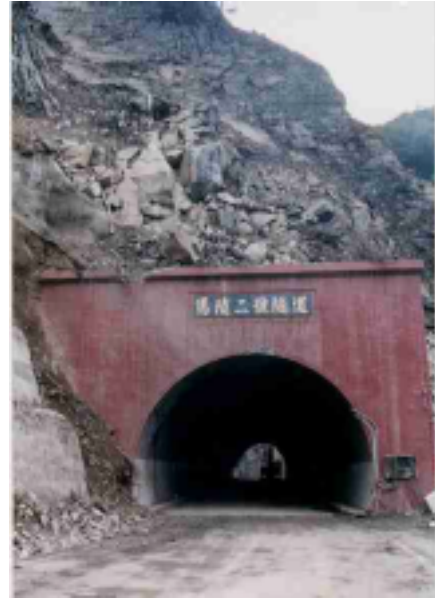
Damage of Ma Ling No.2 Tunnel
